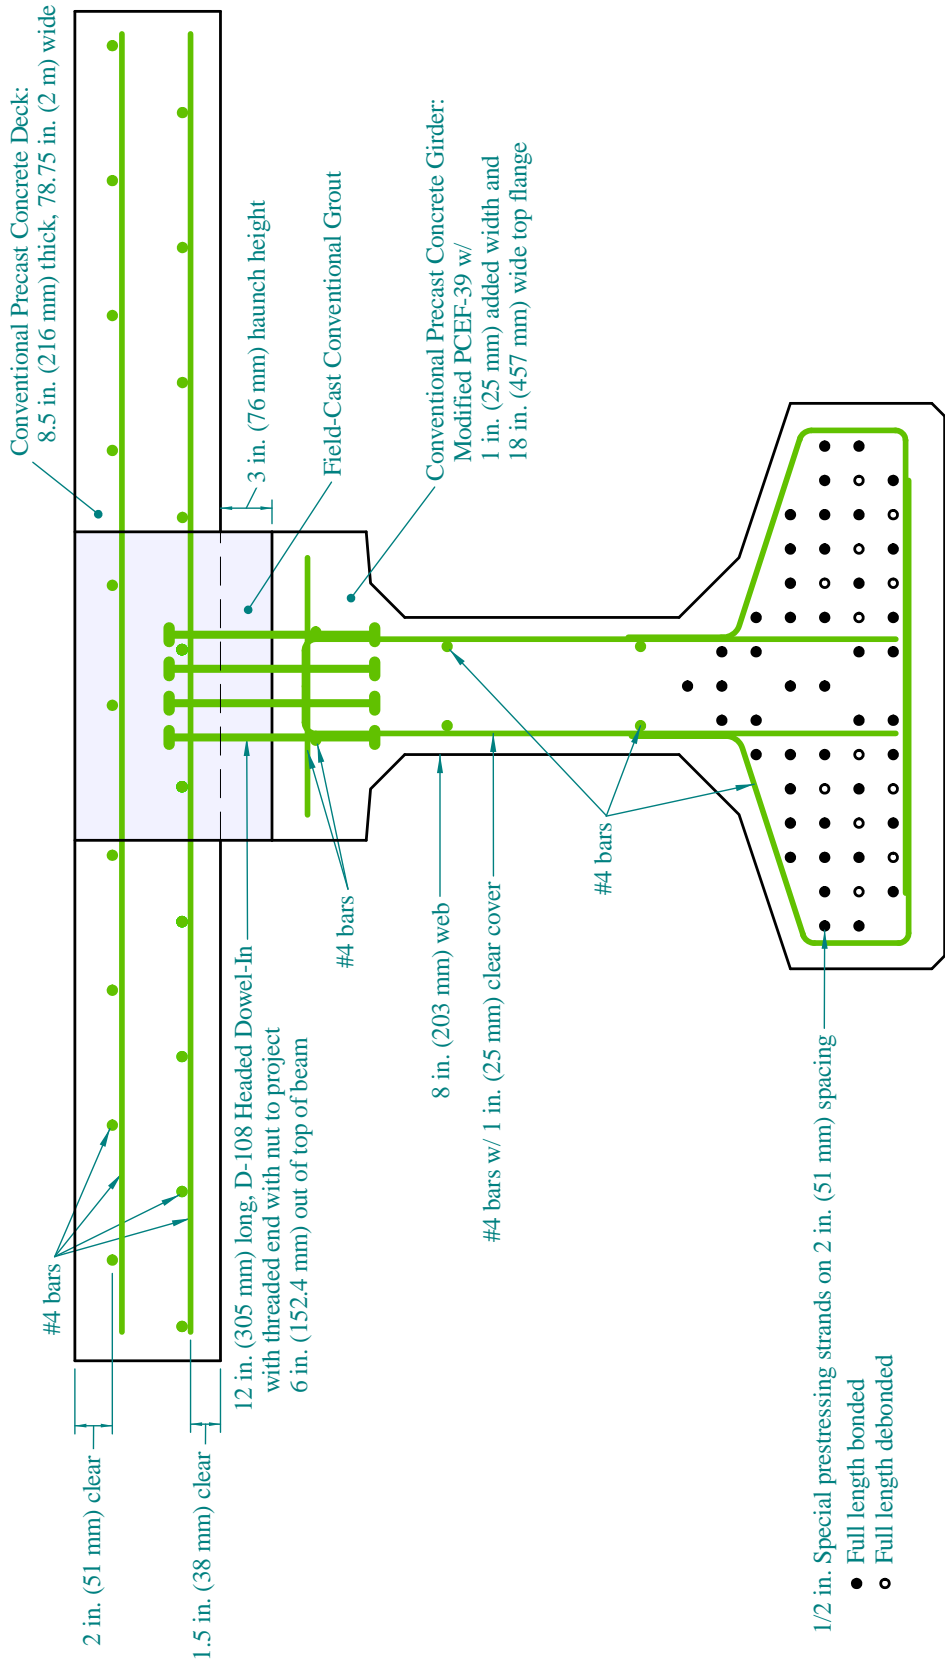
Illustration. Conventional composite connection: Transverse cross section of concrete girder connection.
